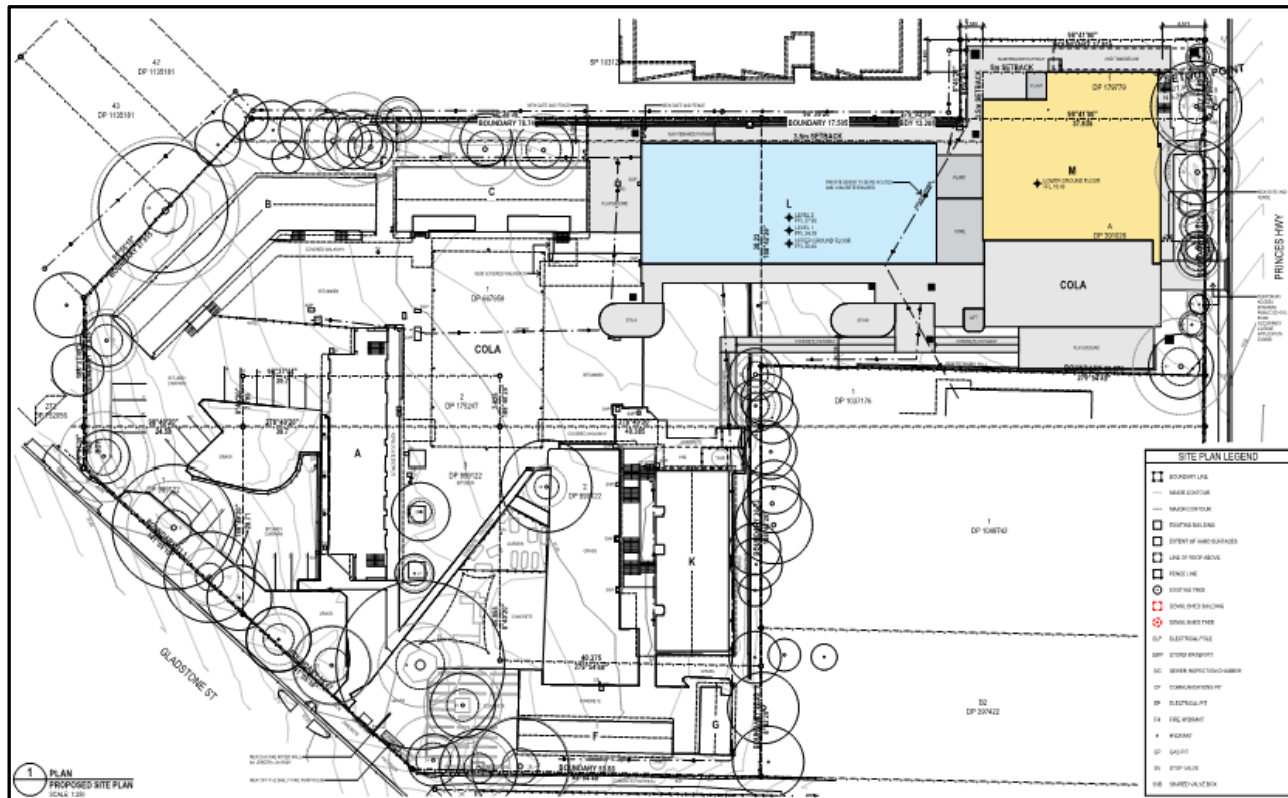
SCHEMATIC SITE PLAN OF KOGARAH PUBLIC SCHOOL UPGRADE
